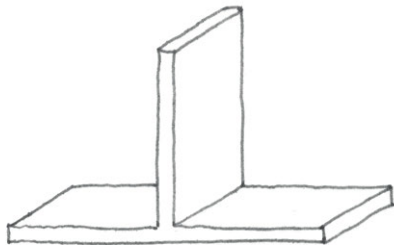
T-joint with 50mm x 200mm glass sheets - this connection was chosen, as it often occurs in architectural glass structures, i.e. glass fins connected to a facade panel or roof beams supporting flat roof panels.
